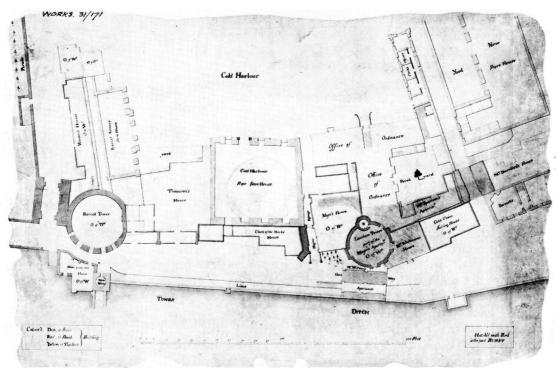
Ordnance plan showing extent of fire damage (hatched area) around Lanthorn Tower in January 1774.
